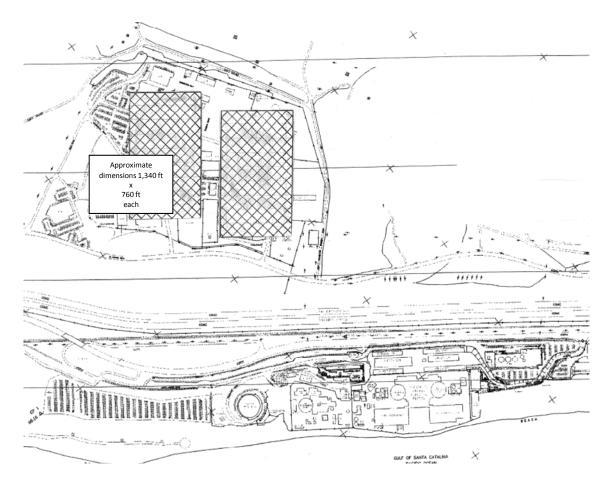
Conceptual Plot Plan Mechanical (Forced) Draft Dry Air Cooling Towers
